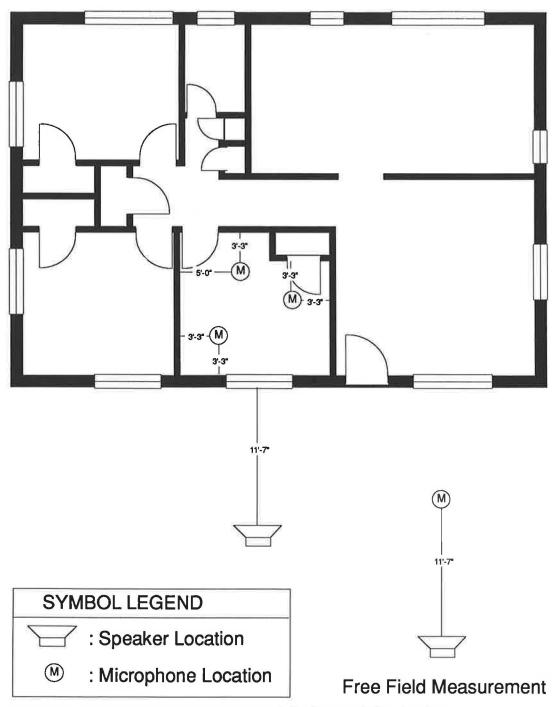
Floor plan of the Aurora sample home indicating acoustical test locations.
